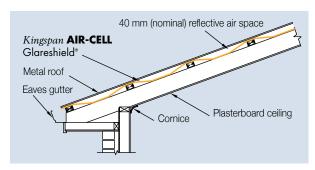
Side elevation of Kingspan AIR-CELL Glareshield  $XL^{TM}$  in a metal roof with a raked ceiling
